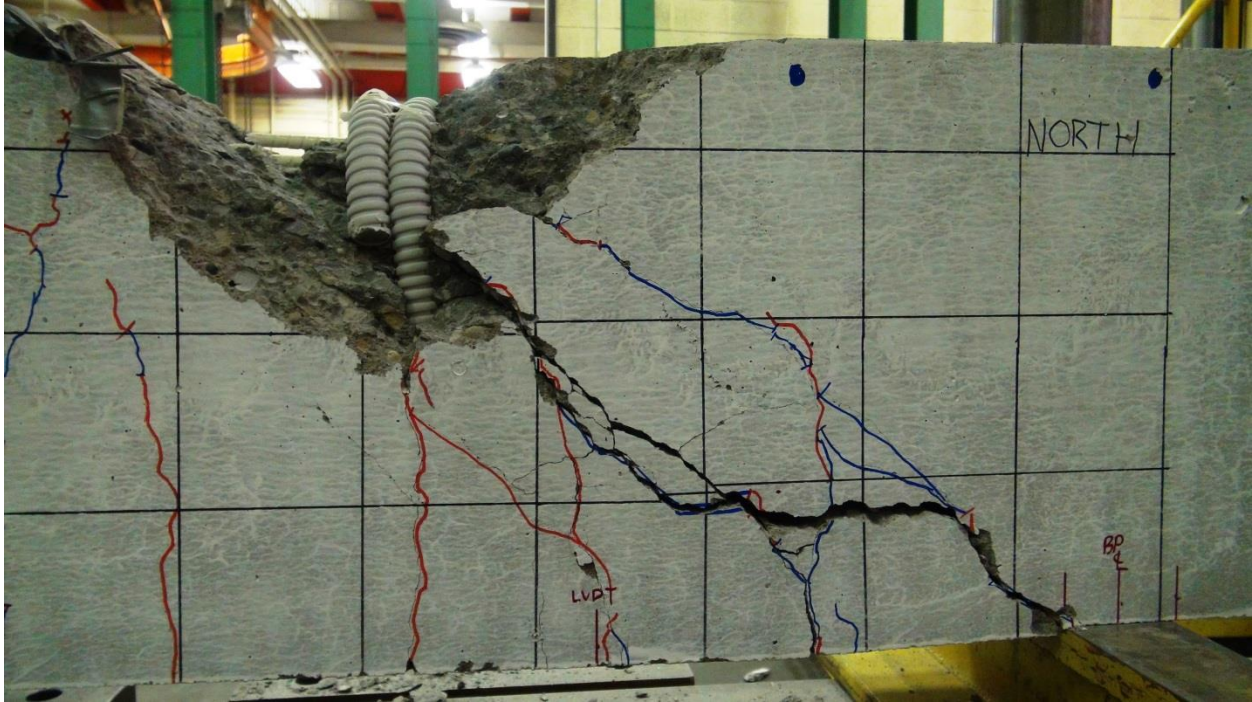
BM12-s230 Alternative Photo of Entire Beam Under Load After Testing
